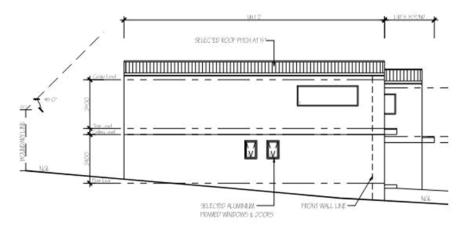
West Elevation for Units 2 to 5 (G Hills & Partners Architects, 2020)
